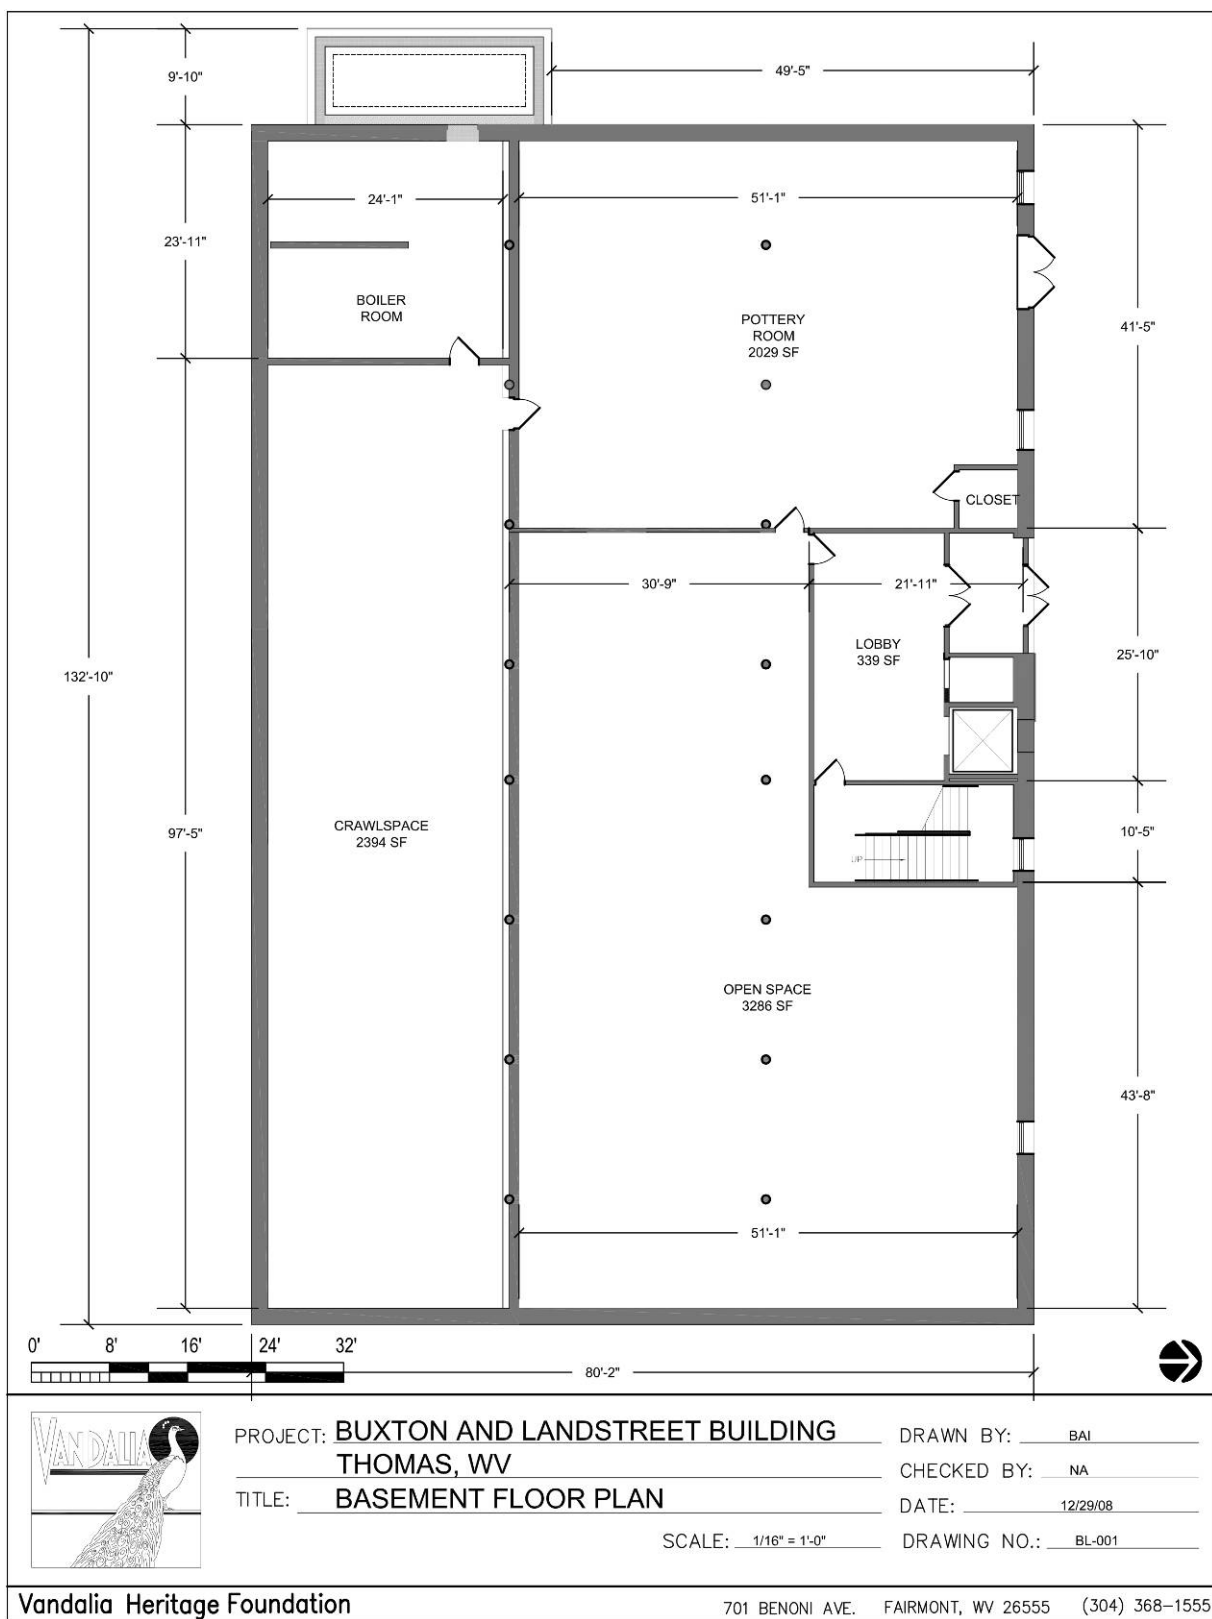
Buxton and Landstreet Company Store Floor Plan, Basement
